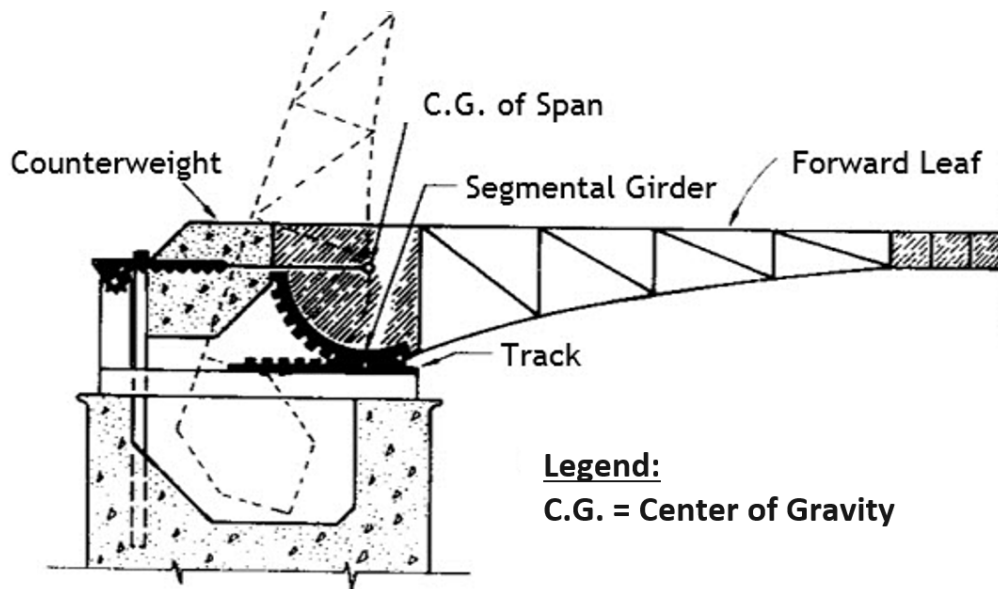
Rolling Lift Bascule Bridge Schematic
